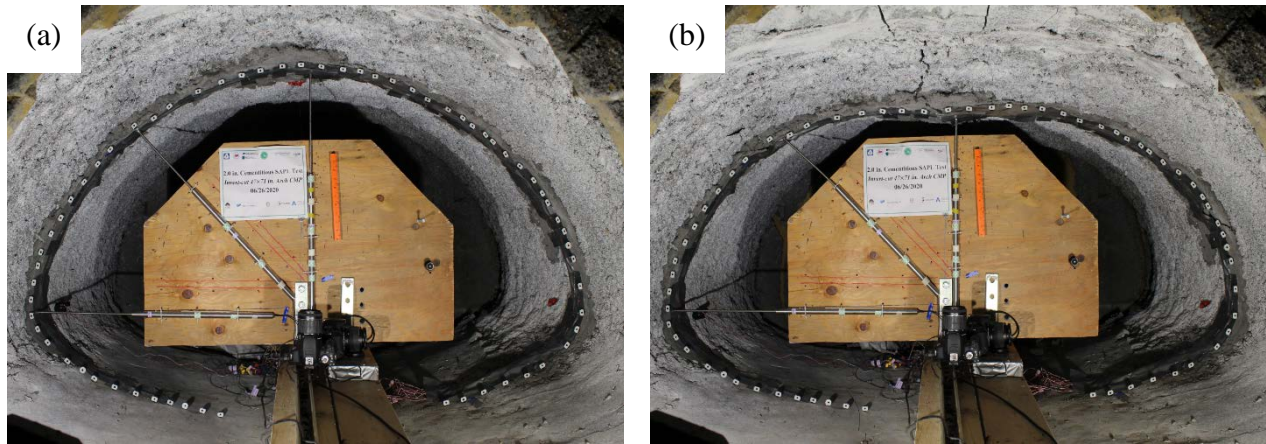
Invert-cut pipe arch renewed with 2 in. cementitious SAPL: (a) before loading, and (b) after loading.
